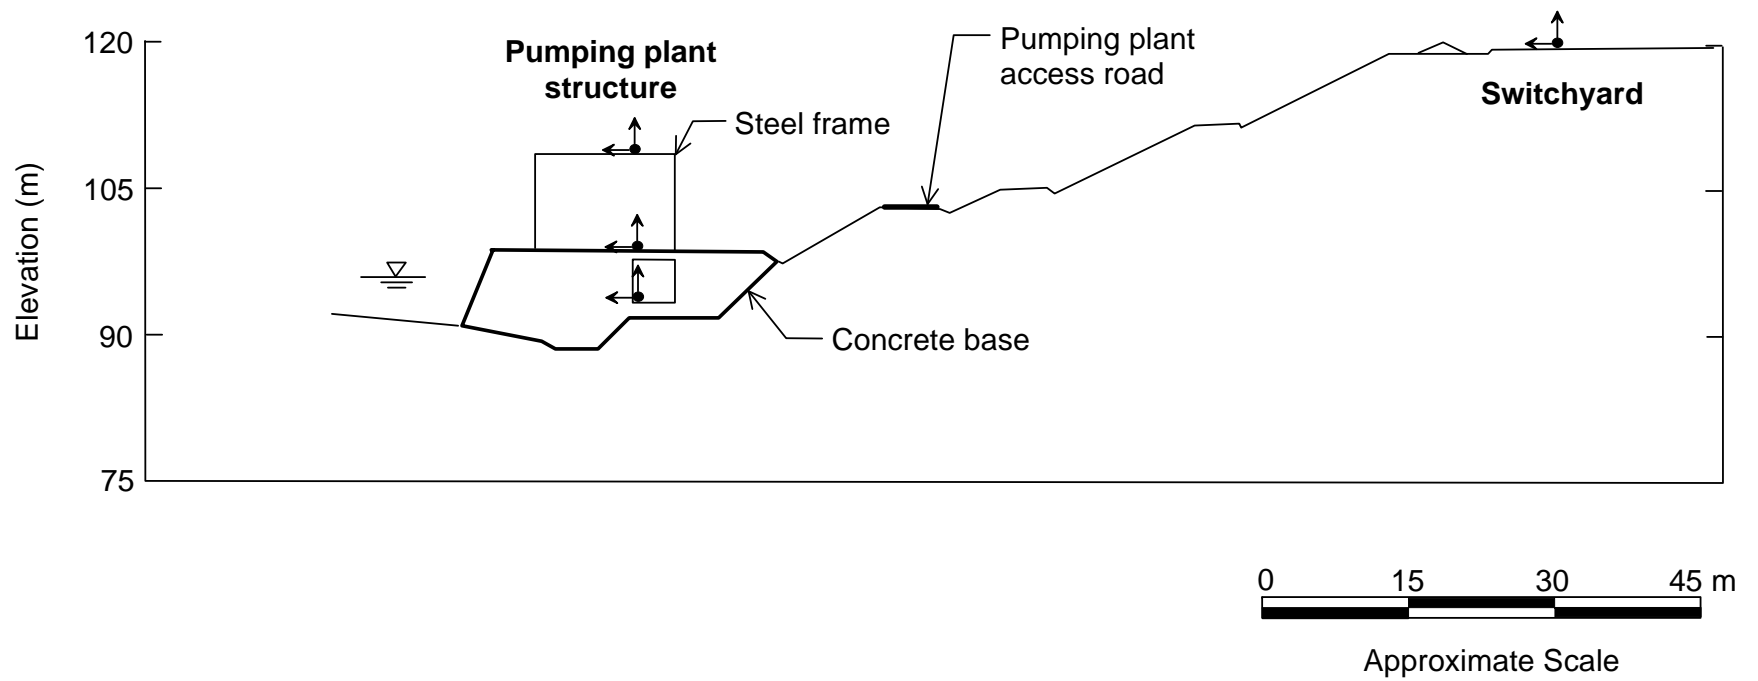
Cross section through pumping plant site showing locations of strong motion accelerographs
